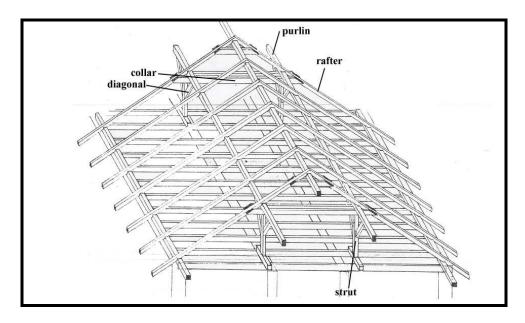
Two purlin hip roof is composed of rafters, purlins, diagonals, collars and struts. The ridge purlin is placed for easy installation (Binan, 1990:78).
